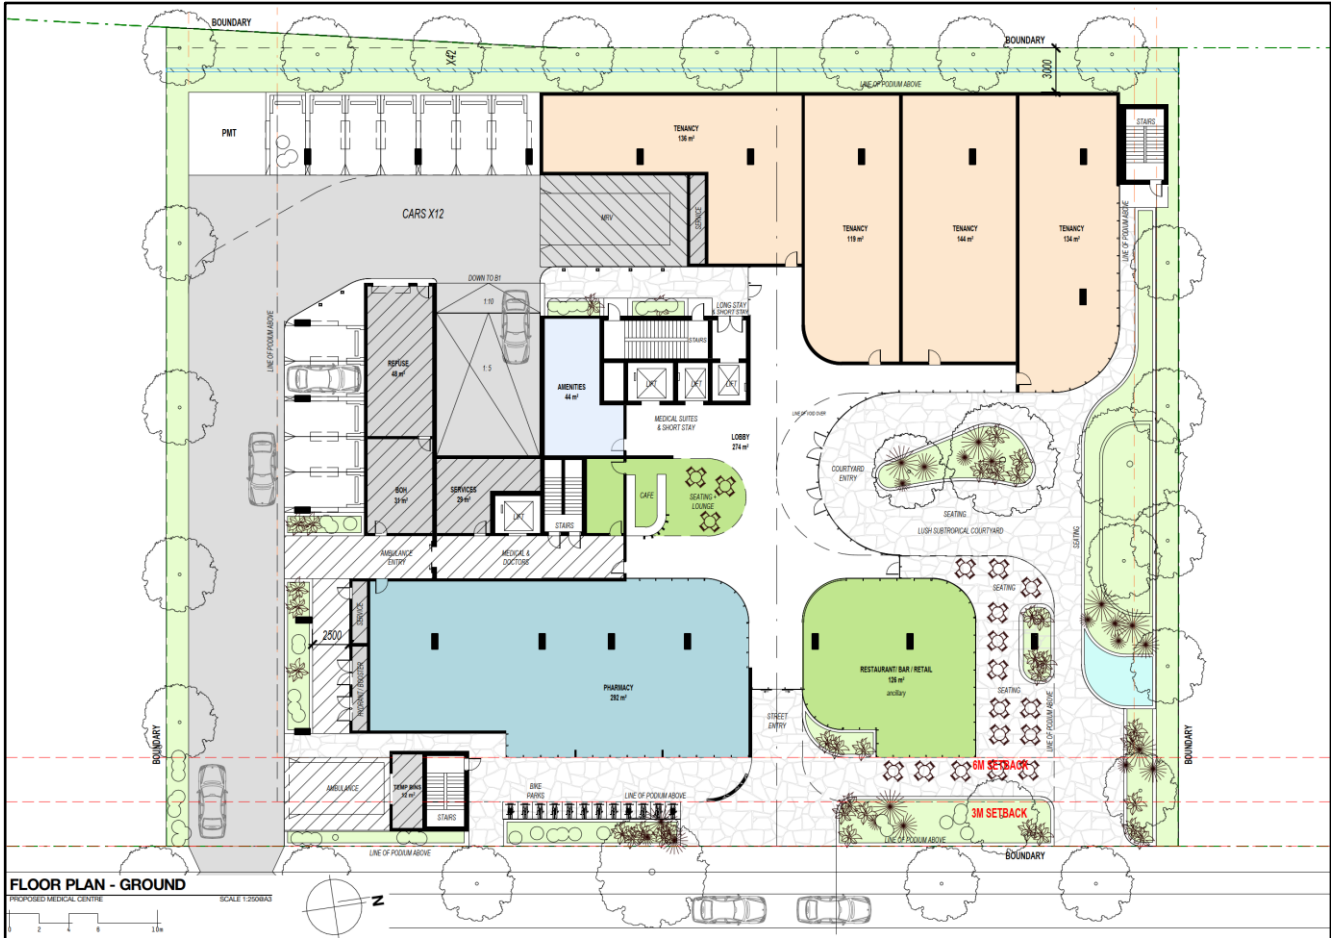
FLOOR PLAN (BURLING BURROWS DRAWING: CUR01-SK-23-DA1)
